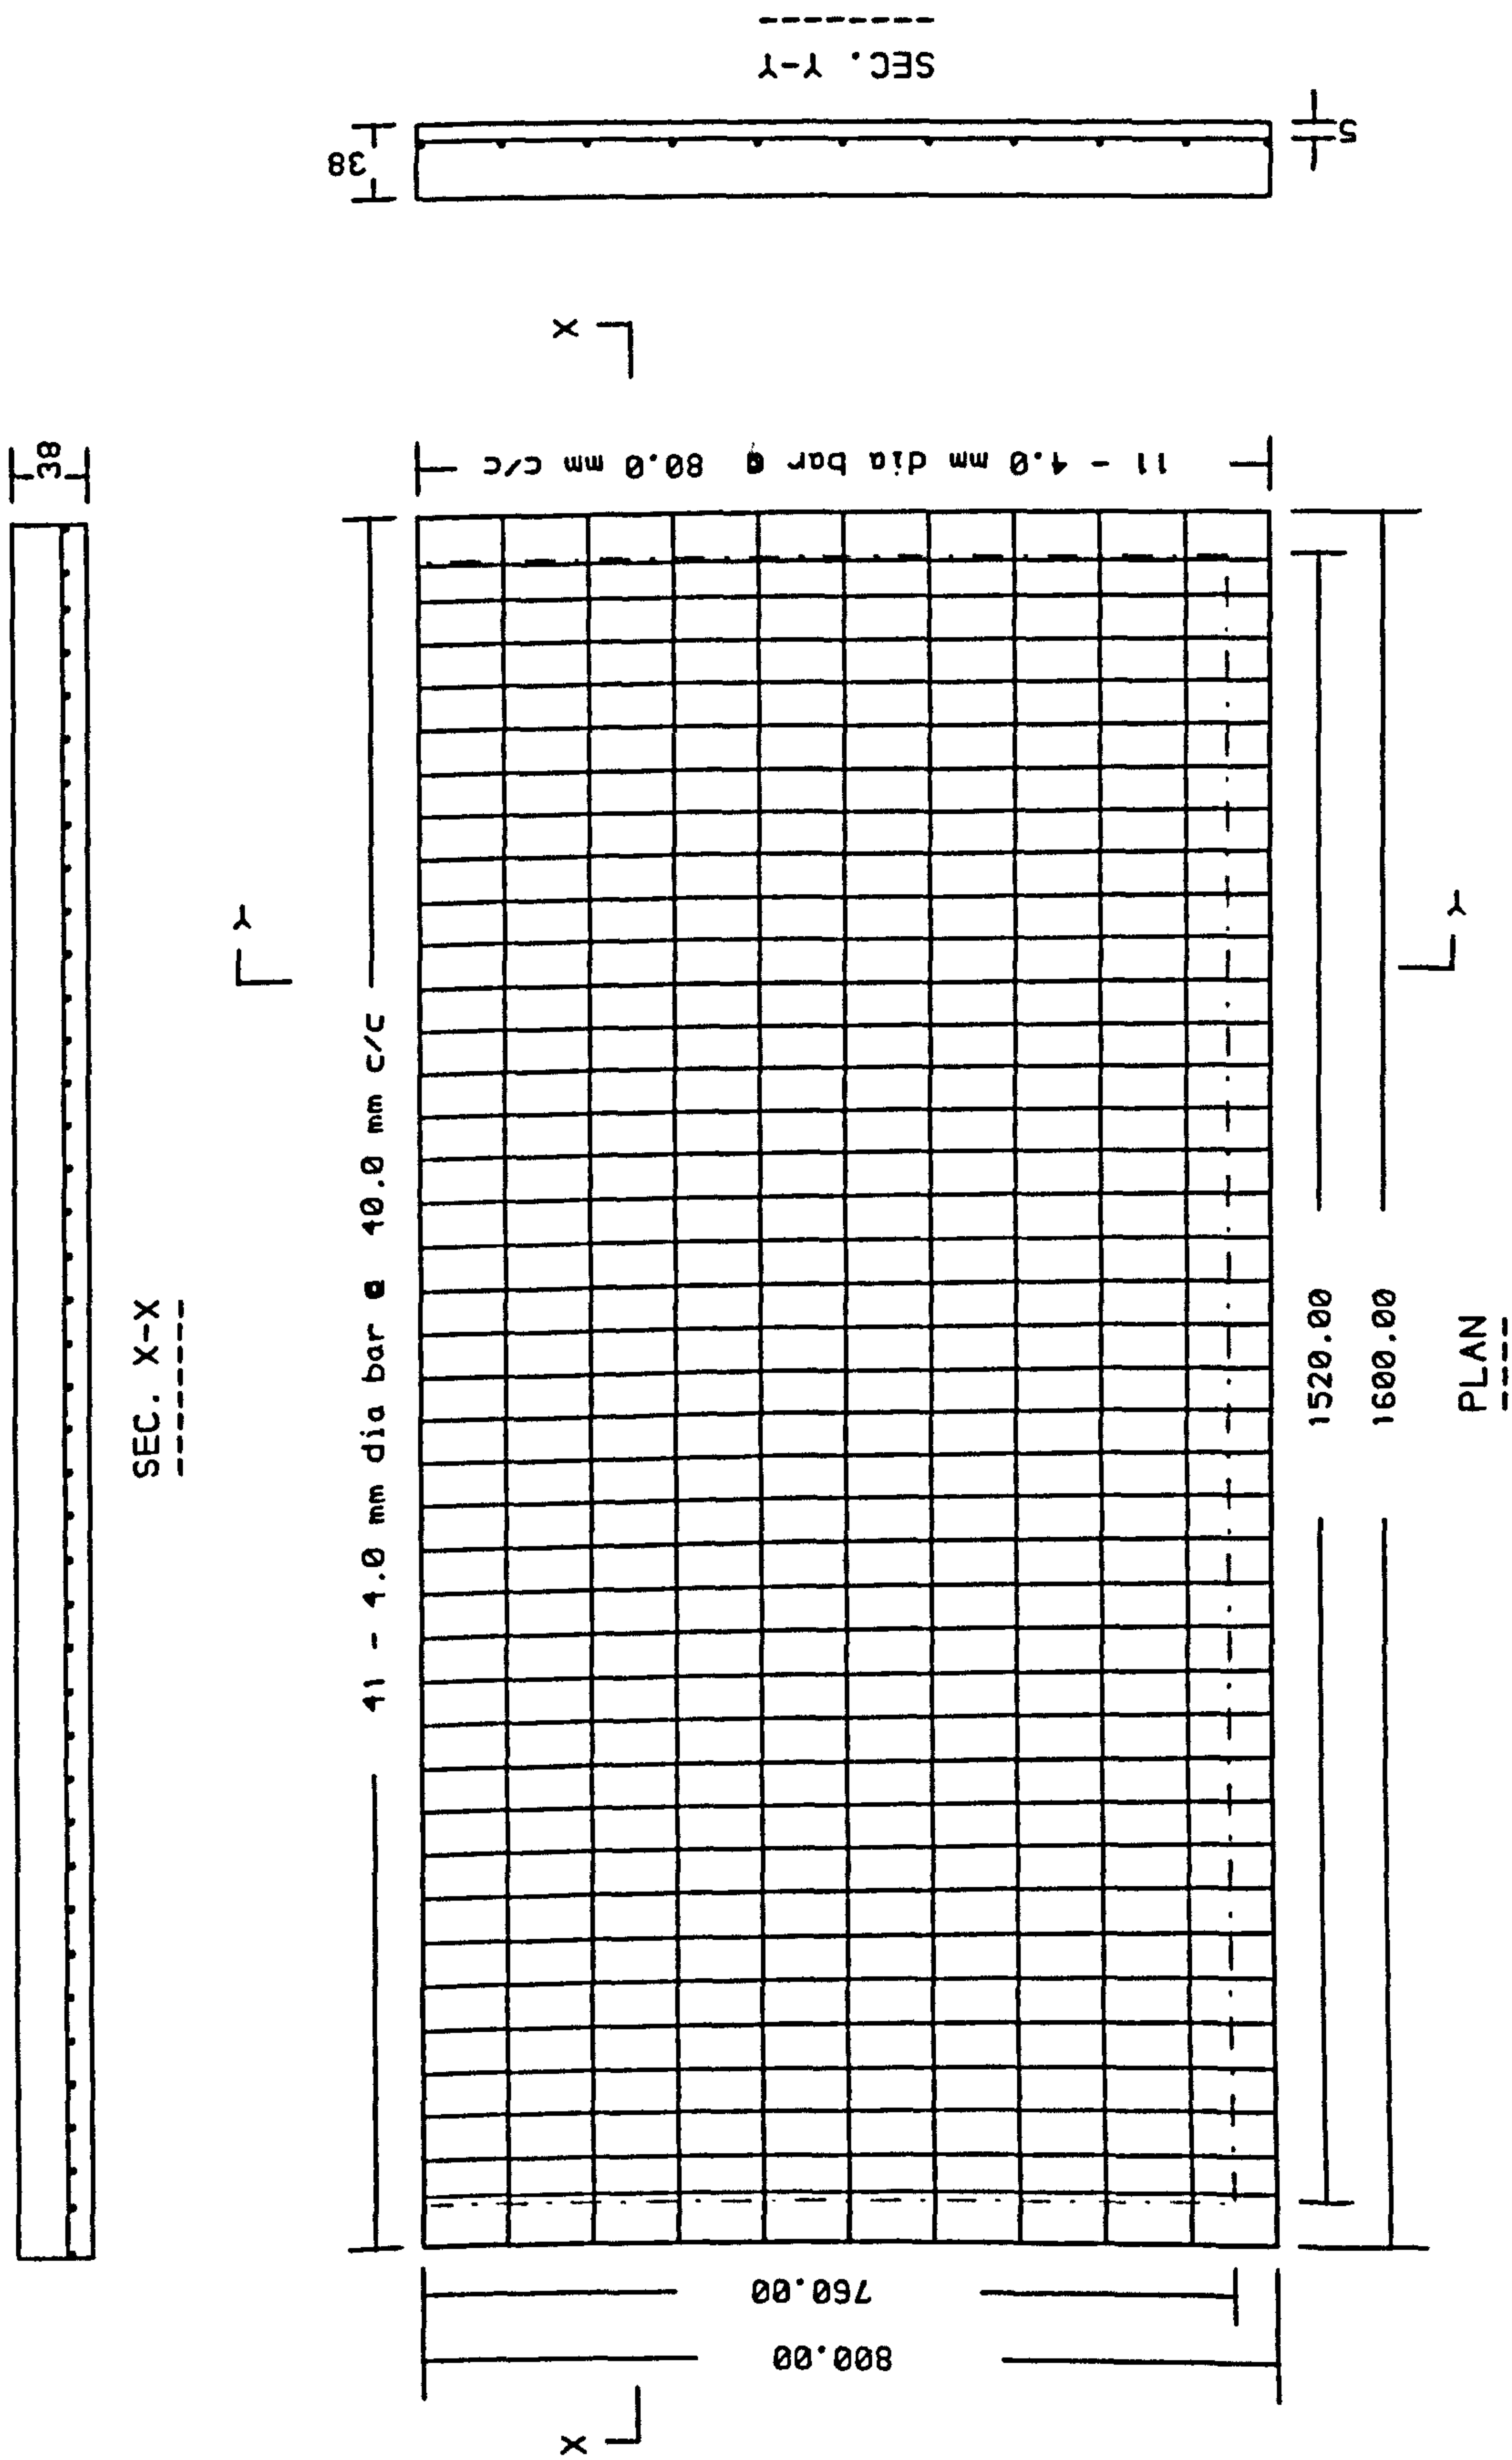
REINFORCEMENT LAYOUT FOR SLAB S4:3UD & S6:3P1
